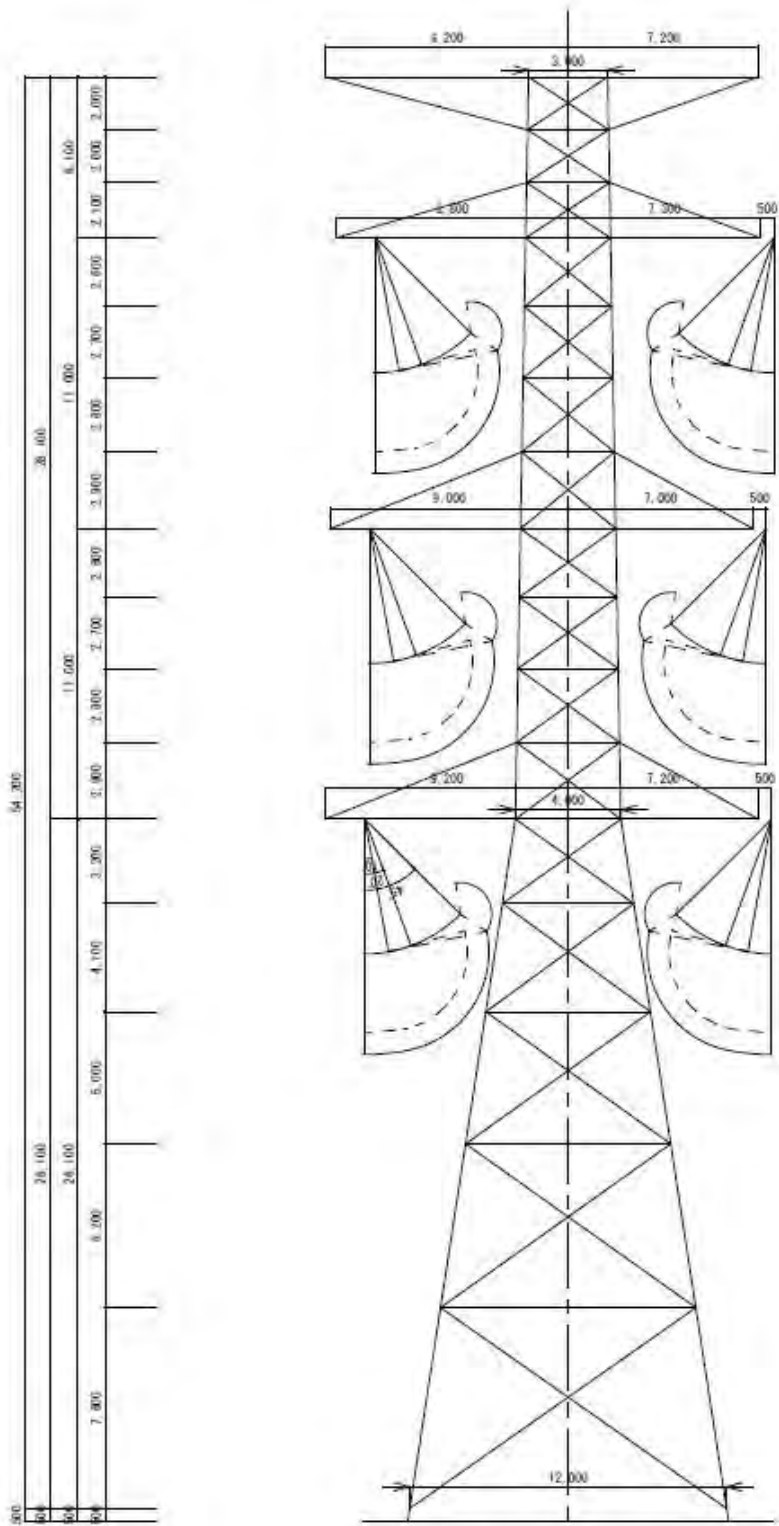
Assumed 400 kV Suspension Tower (TDL)
